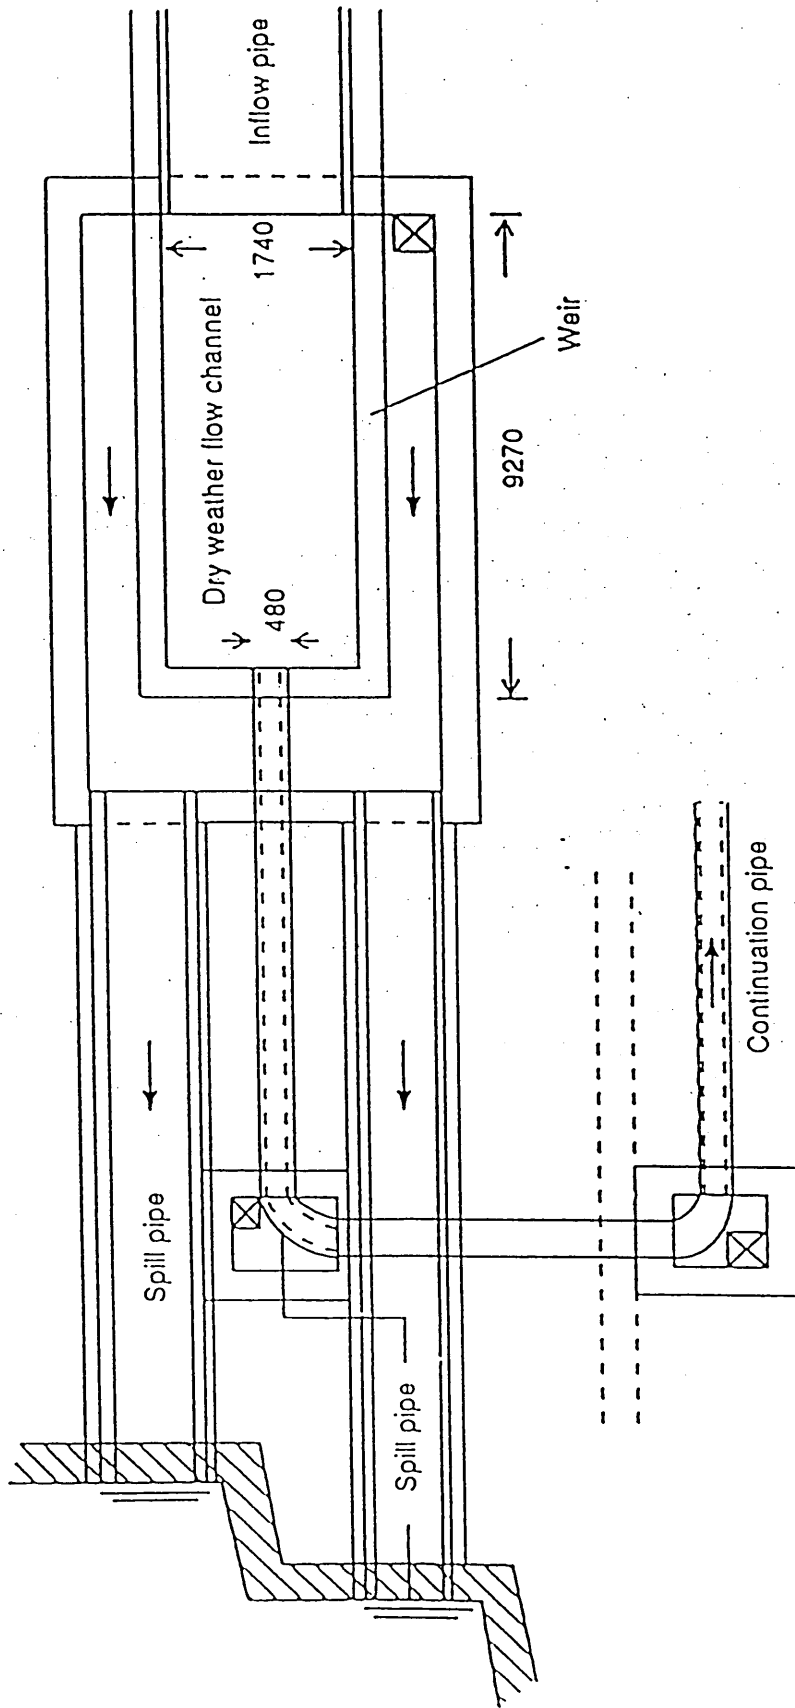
Plan of the High Side Weir Site (Leyburn Road)
